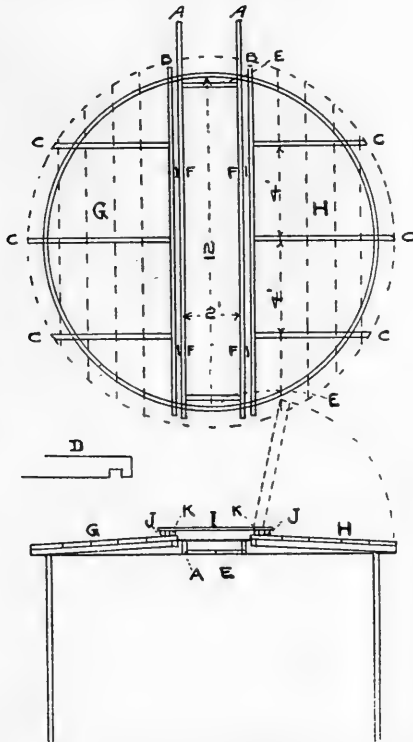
A CHEAP ROOF OF STAVE SILO.
